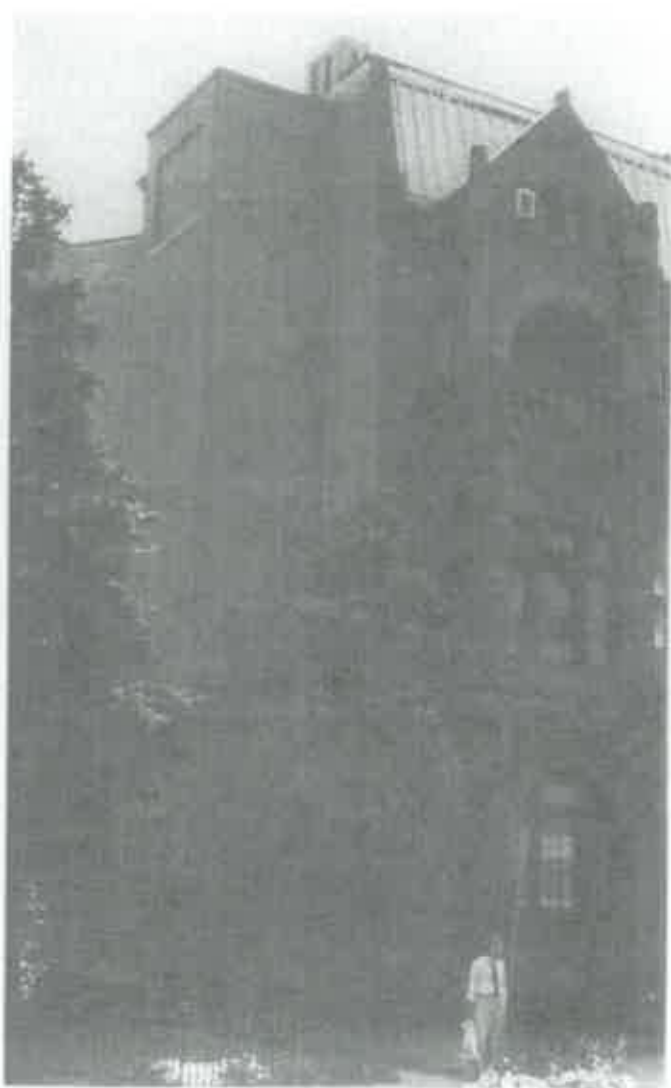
Creating an accessible entrance with a new elevator tower requires a compatible design. This elevator addition blends in with the historic building's materials and provides access to all public levels. Photo: Sharon Park.
